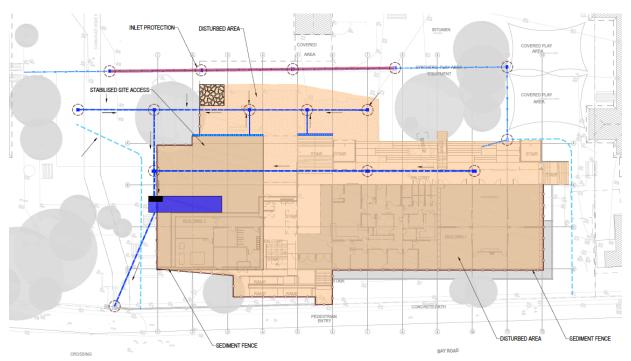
Extract of proposed sediment and erosion control plan (Source: Aurecon)
